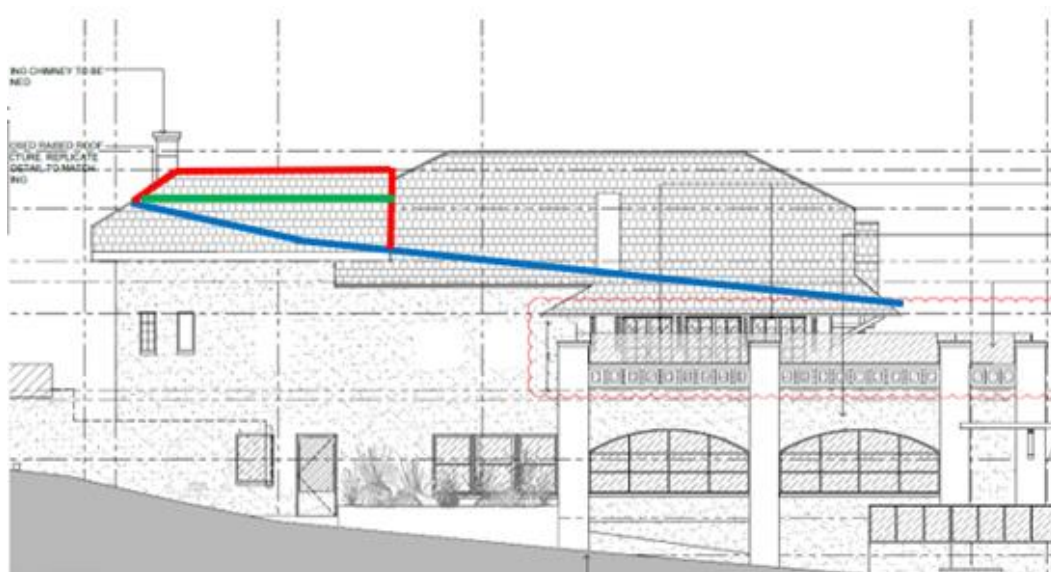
Plan extract eastern elevation showing the height non-compliance based on ground level (existing). The blue line shows the 8.5 metre height standard, the red line the extent of proposed new works located above the height standard and the green line the existing building ridge height in this location.
